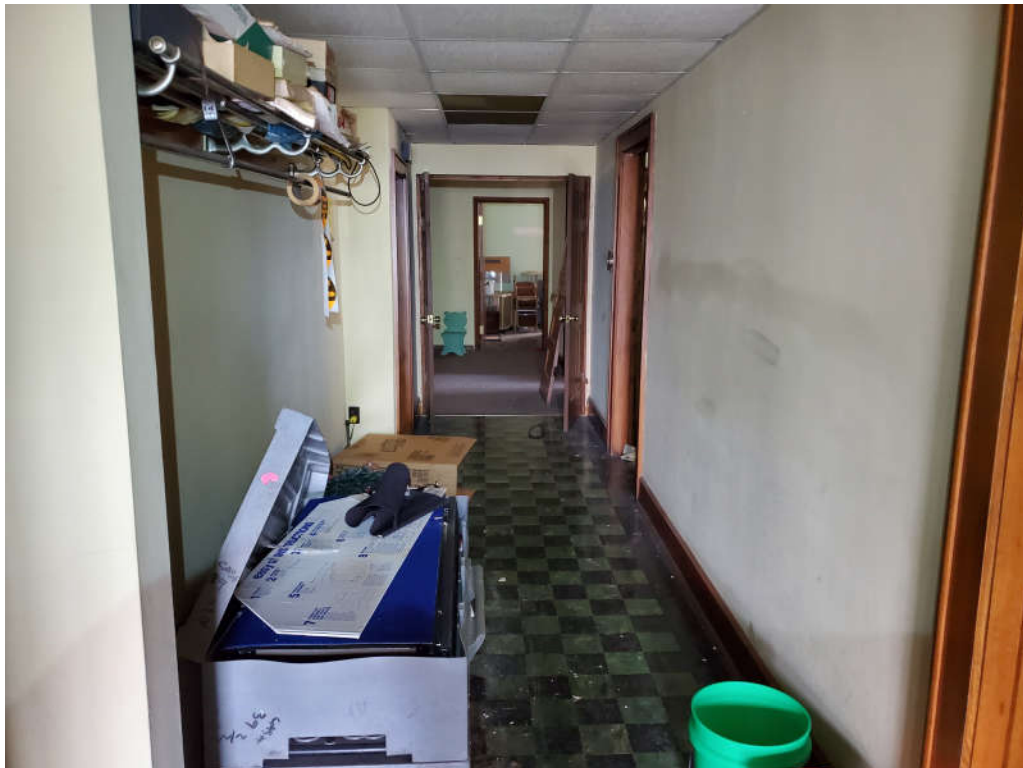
View of black and green floor tile (HAs 9 and 10) and 2'x4' black floor tile (HA 19) in the hallway.
